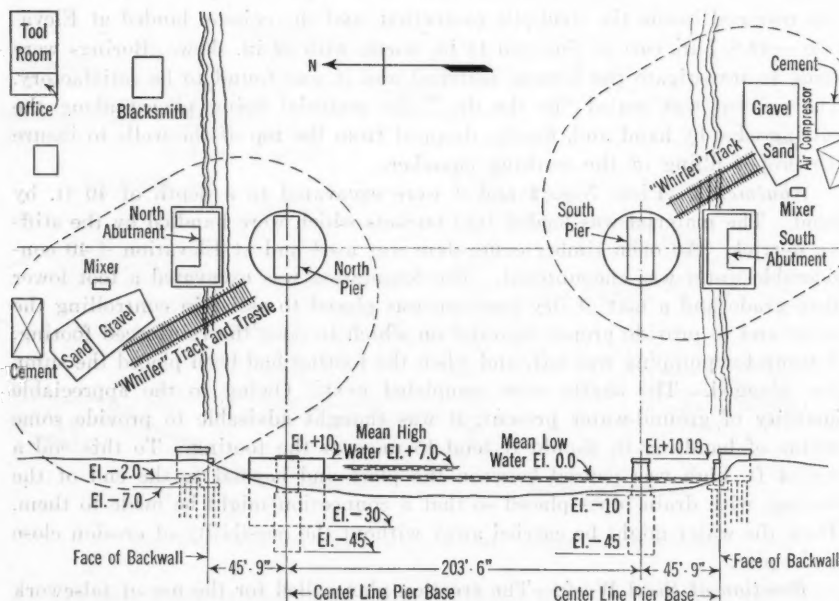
PLANT LAYOUT, REEDY POINT SUBSTRUCTURE.
